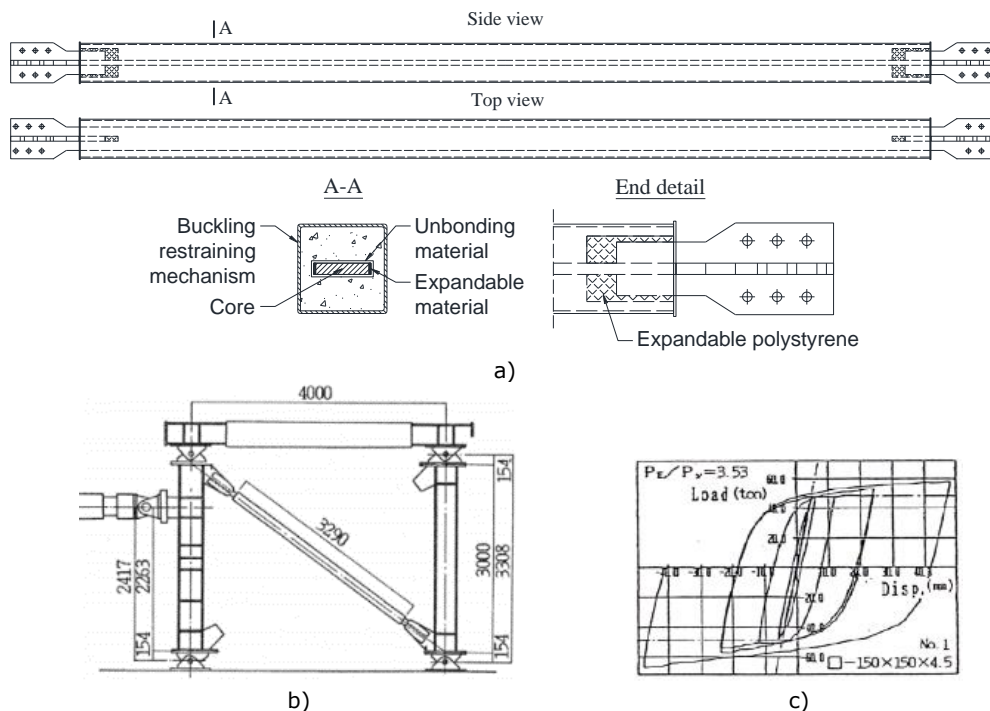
First tests on Unbonded Braces by Wada et al.: a) typical specimen details, b) subassemblage test setup, c) successful hysteretic response (adapted from [20])
